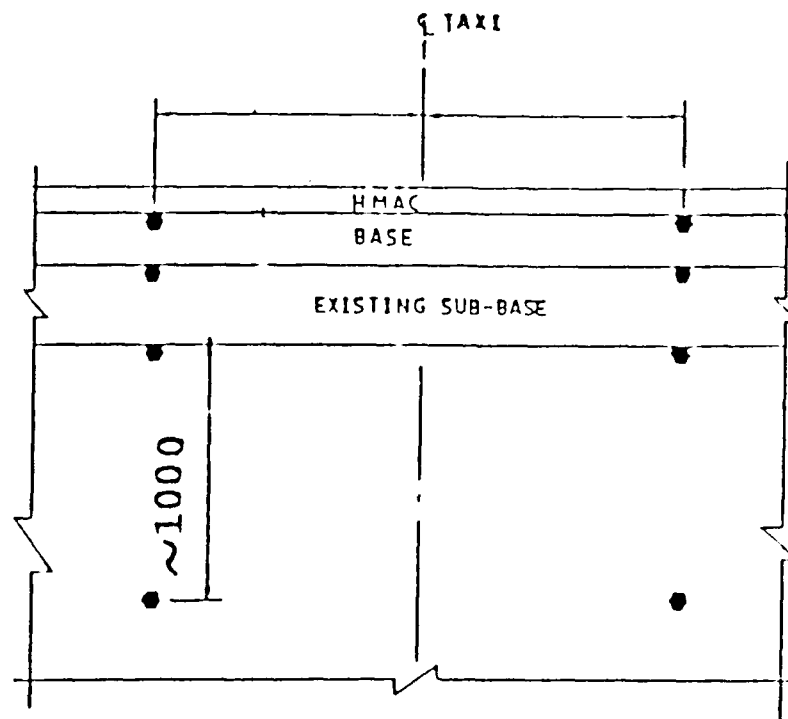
Arrangement of load cells in the pavement at Thompson
